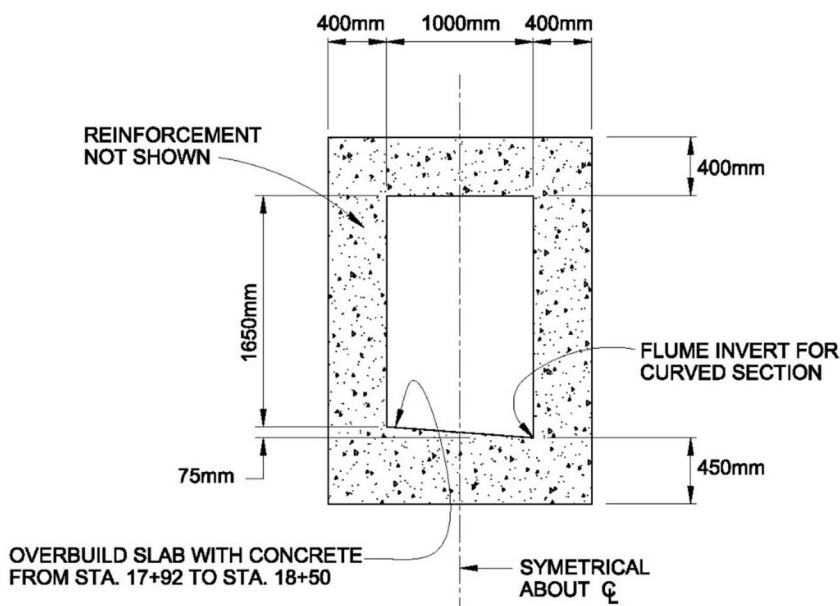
Example of a Structural Cross Section Prepared with Metric Units
